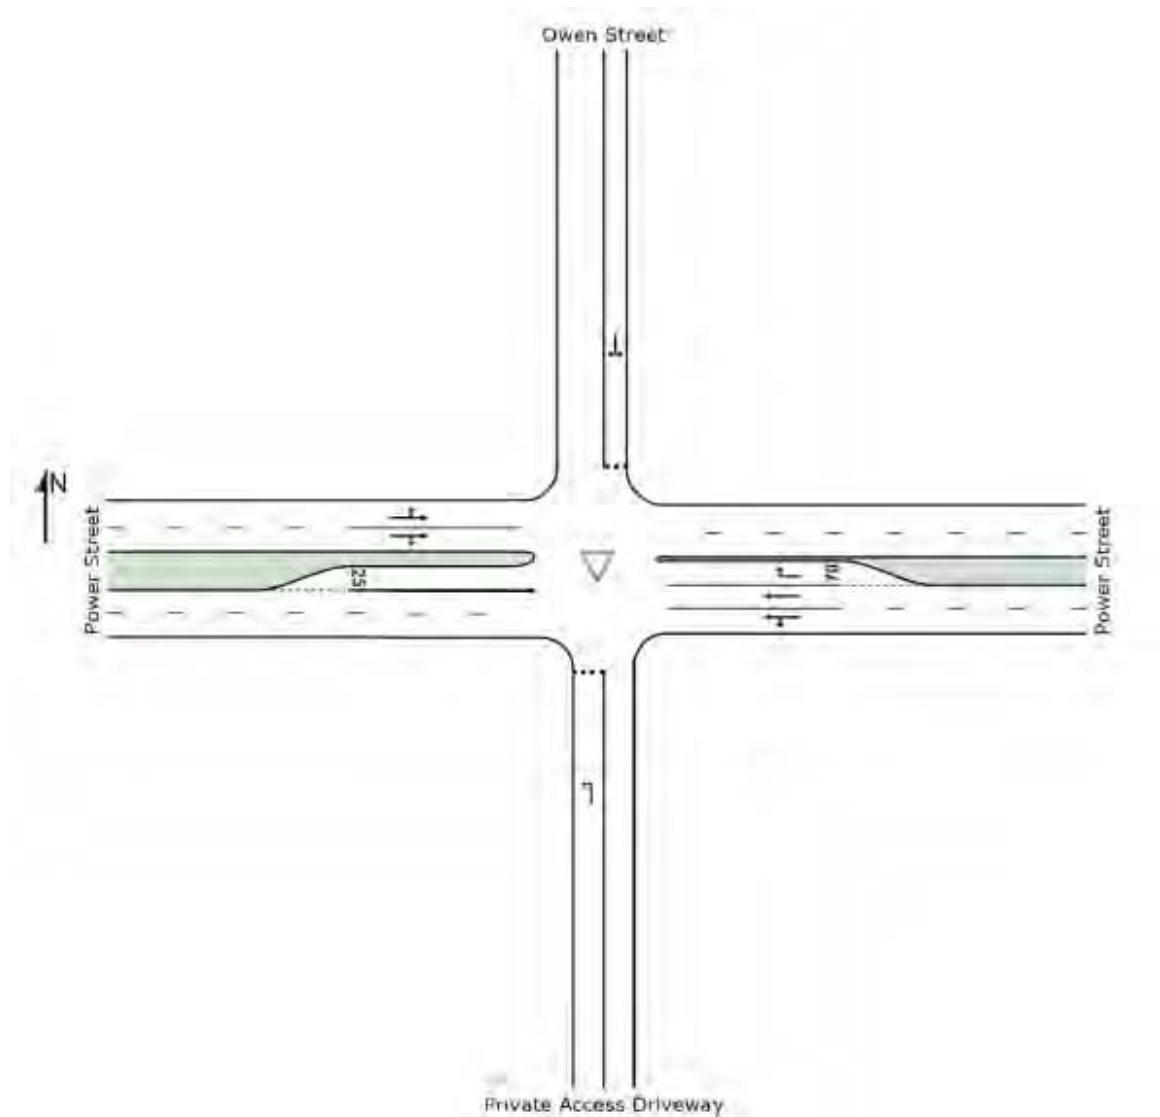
Owen Street / Power Street / private access driveway intersection layout
